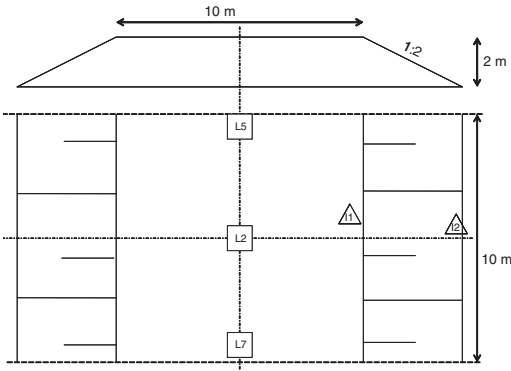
Layout of some of the instrumentation on Murro test embankment.
